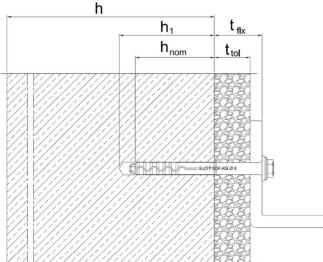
Intended use: screw head type: hexagon head with collar (KB)
